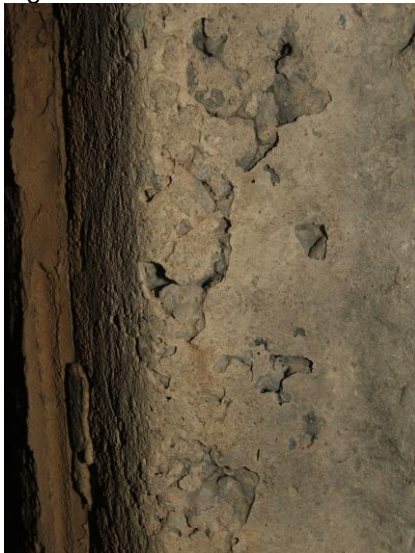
The cracking and delamination of the concrete due to corrosion of the rebars
